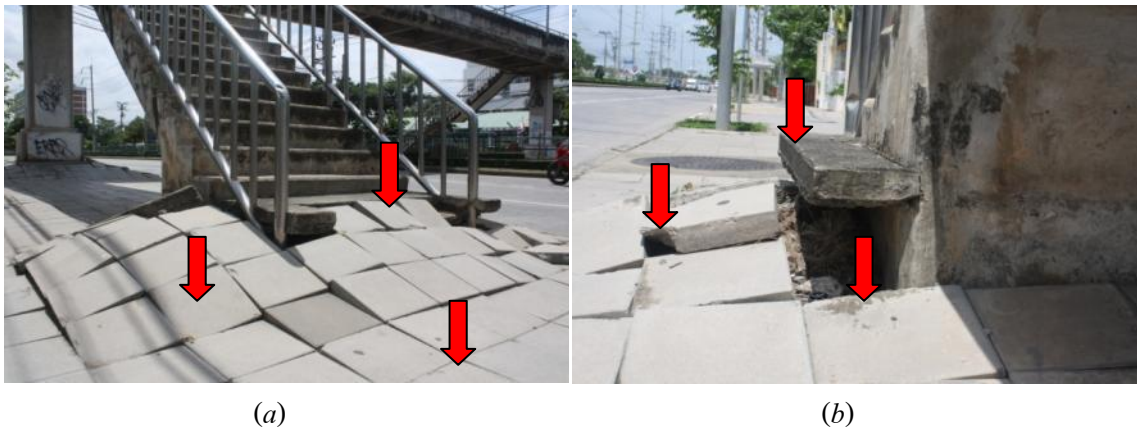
(a) show the irregular sidewalk surface and (b) the collapse on sidewalk and Ladder Bridge.
